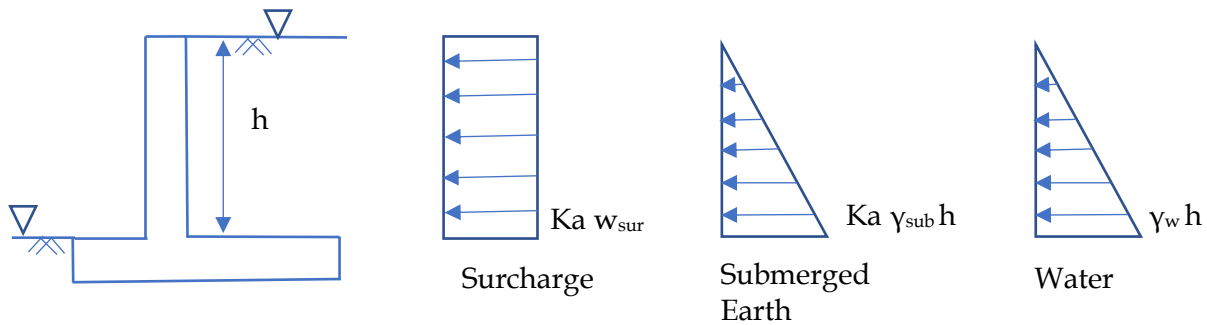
Horizontal Pressure Loads acting at Case 3 on the Retaining wall
